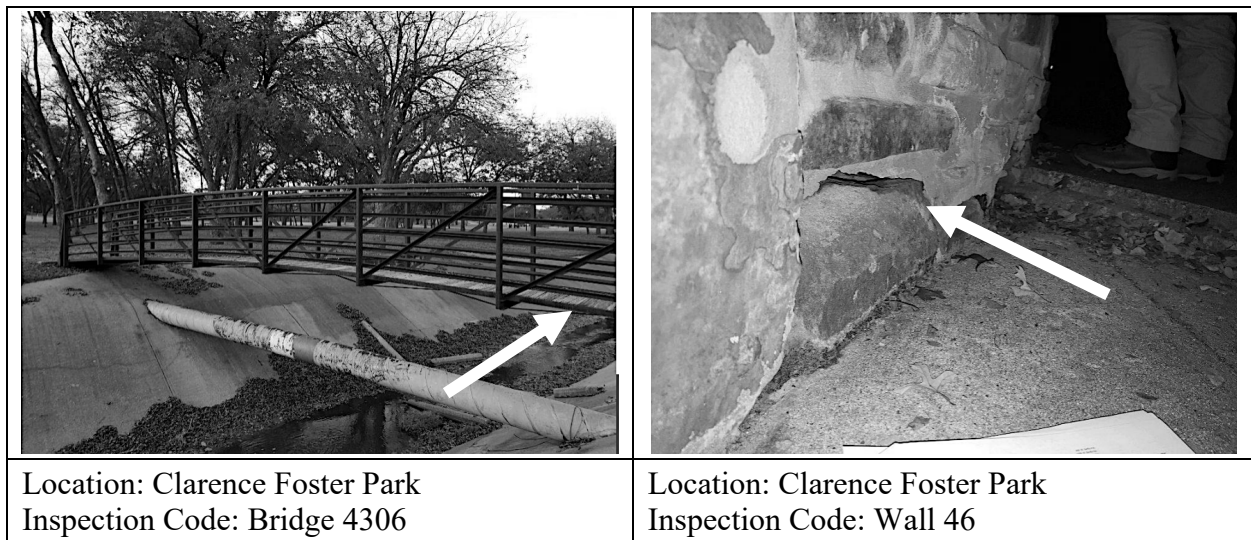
Walkway bridge and wall structure photos taken by students during the park site visits.
